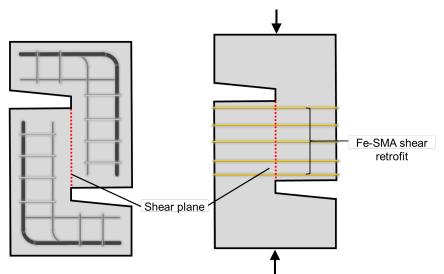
Reinforced concrete push-off specimens with external Fe-SMA retrofit.
